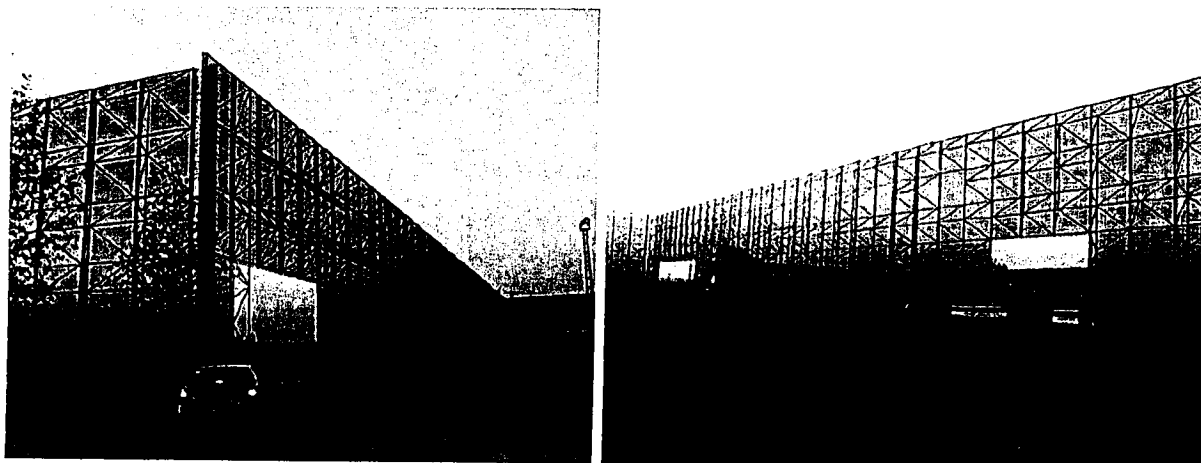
Example of Sprinkler system (left) and Coal Storage Shed with built-in heat sensor & sprinklers (right)
